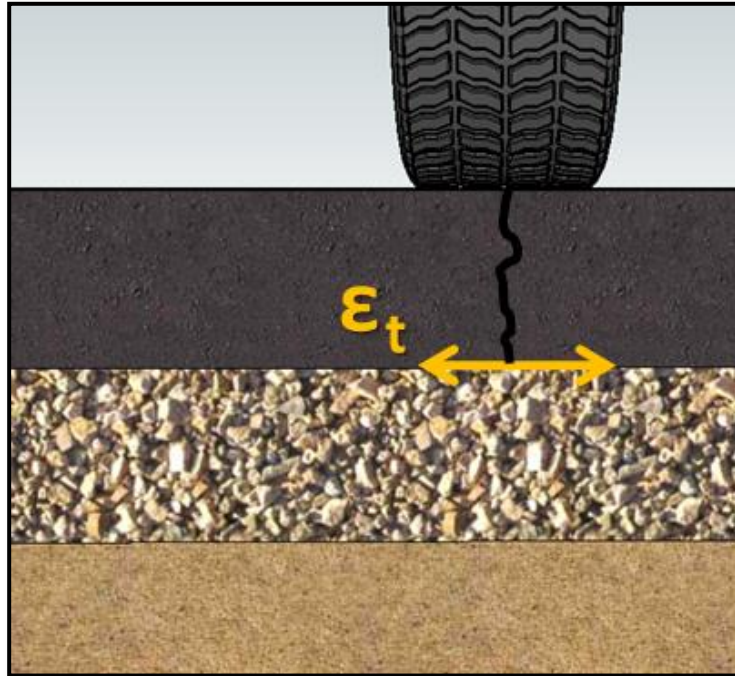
Sketch of Fatigue Cracking in Pavement Cross Section
